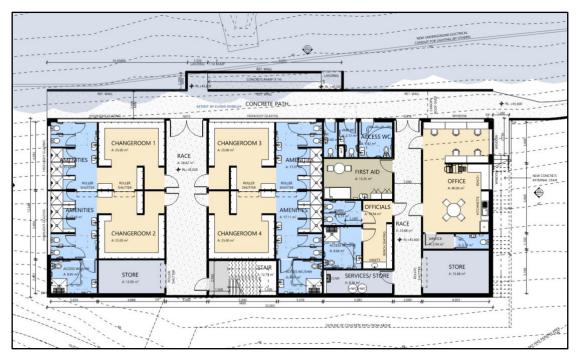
Extent of 1% AEP flood impacts (blue shading) near the proposed building (external Concrete walkway and ramp)
